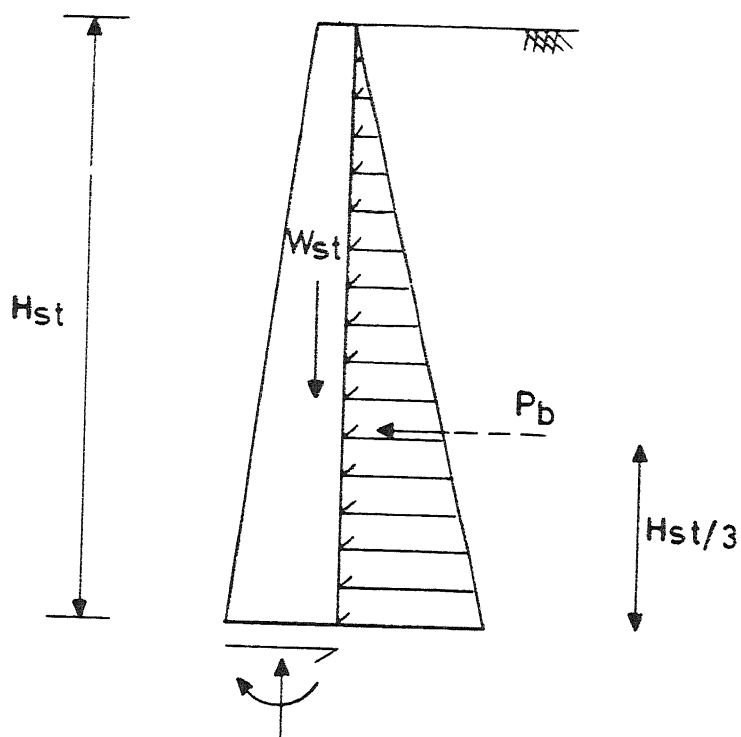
FORCES ACTING ON THE WALL STEM .
